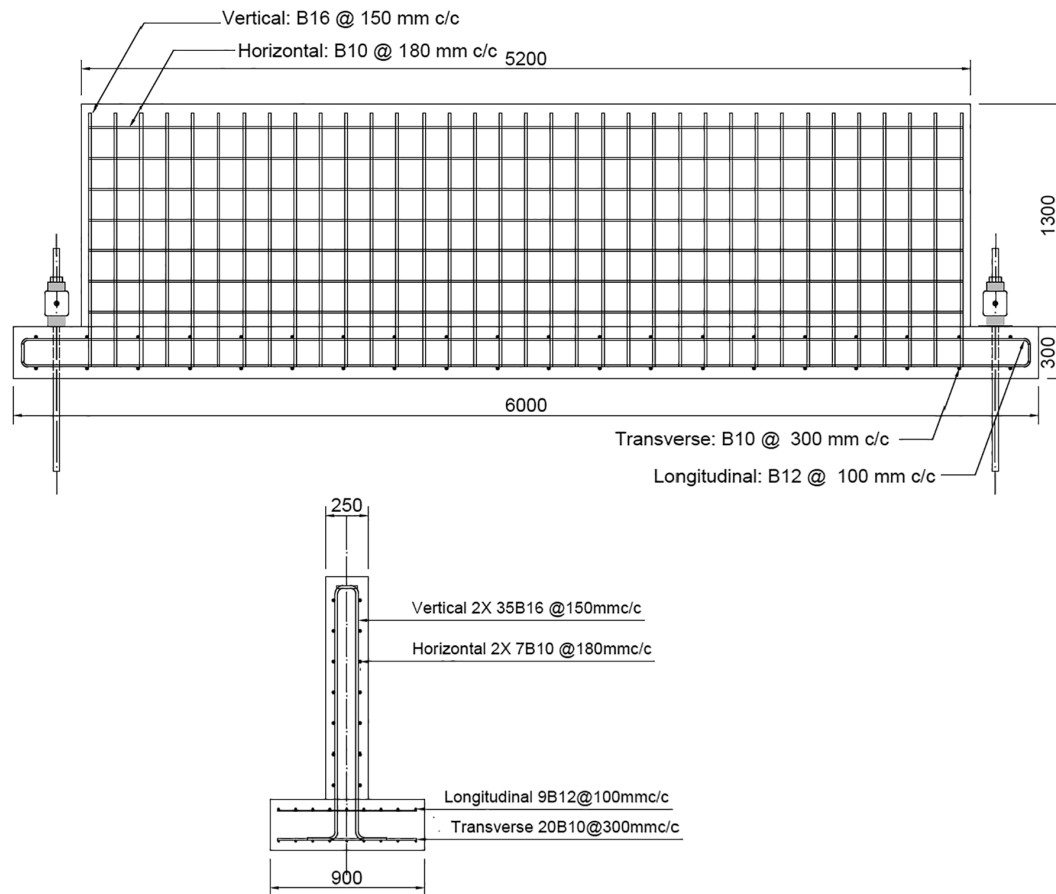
Geometry and reinforcement of walls ICL-1 and UoL-1. ICL, Imperial College London; UoL, University of Leeds
